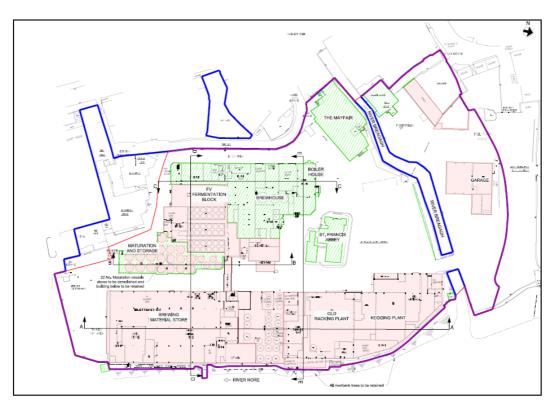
Proposed demolitions shown in brown, structure highlighted in green are to be retained
